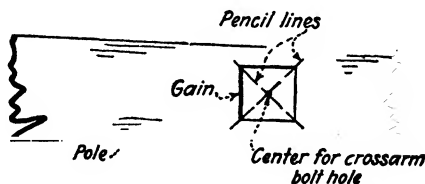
Scheme for determining center for crossarm bolt hole. Two diagonal pencil lines are drawn as shown. The intersection of these lines is the bolt-hole center.
